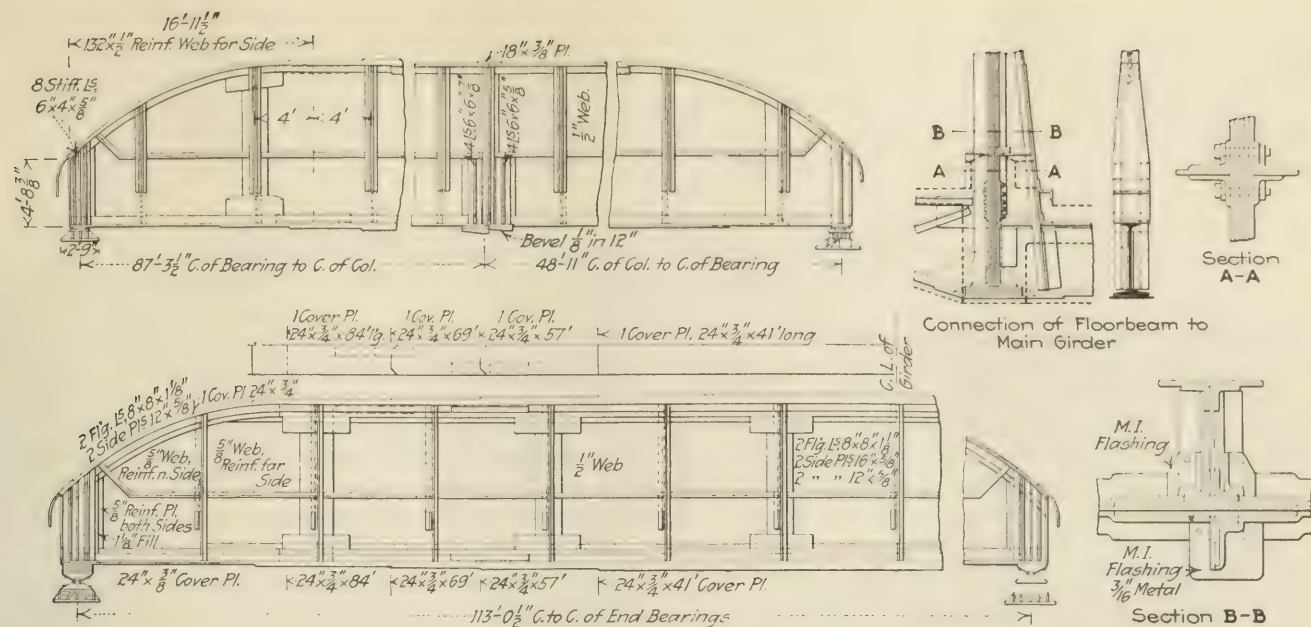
DETAILS OF LONG-SPAN PLATE GIRDERS
